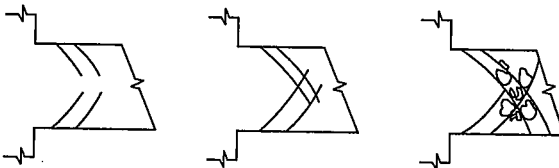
Progressive failure of reinforced concrete hinge zone under seismic loading
